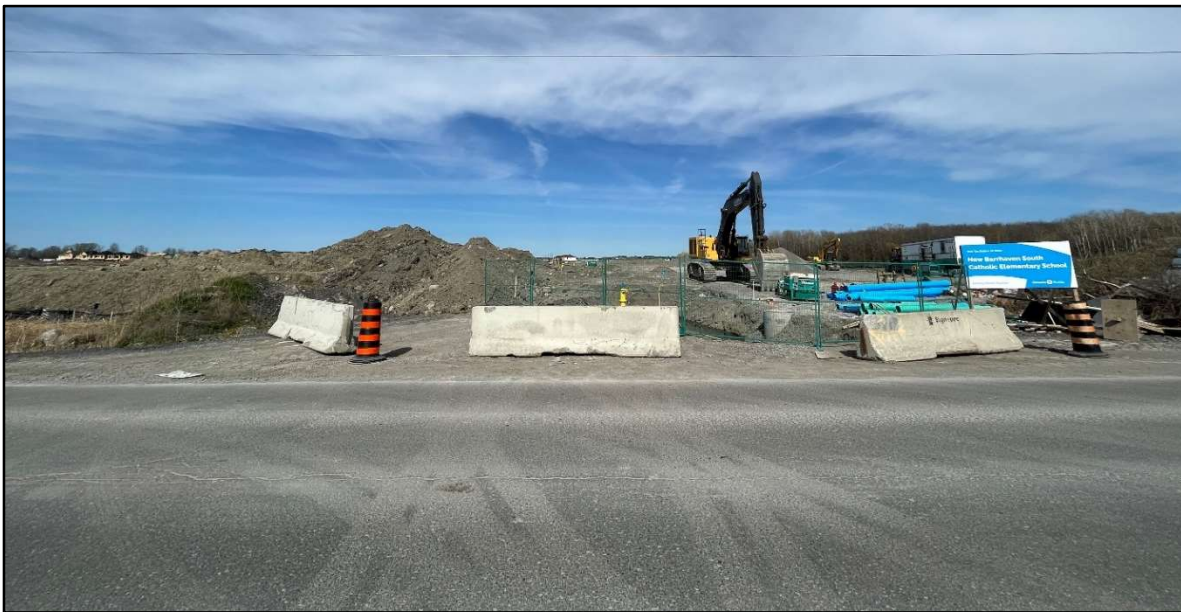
Exhibit D: Photograph of the future intersection of Flagstaff Drive and Borrisokane Road taken from the west side of Borrisokane Road
